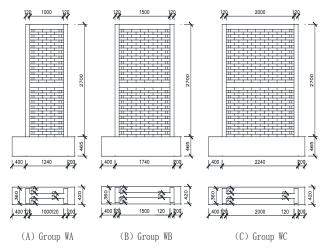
WALL SPECIMEN DIMENSIONED DRAWING
